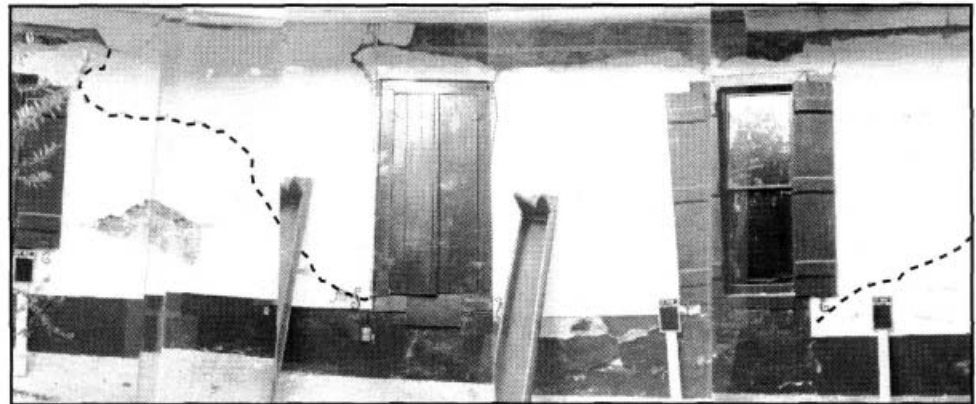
West wall of west wing. Flexural crack extends from upper left diagonally to the base of the wall and along base (dotted line along crack).
